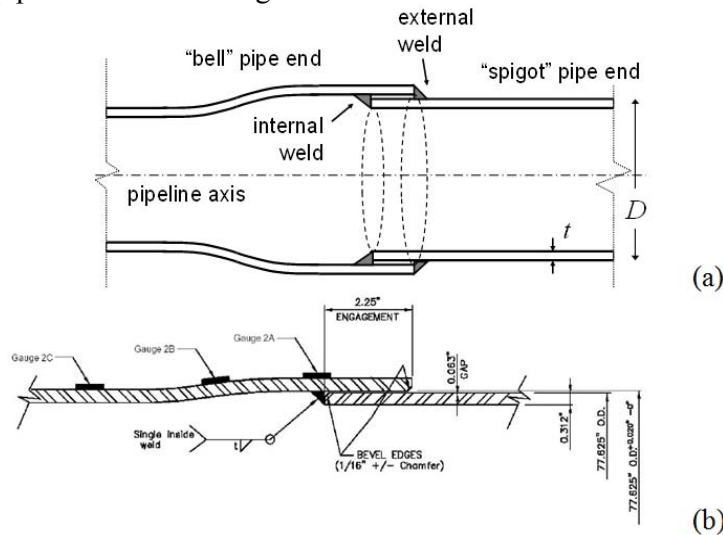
(a) Configuration of a welded lap joint; (b) Detail of an internal welded lap joint in a 77-inch-diameter pipe [Smith, 2006]
